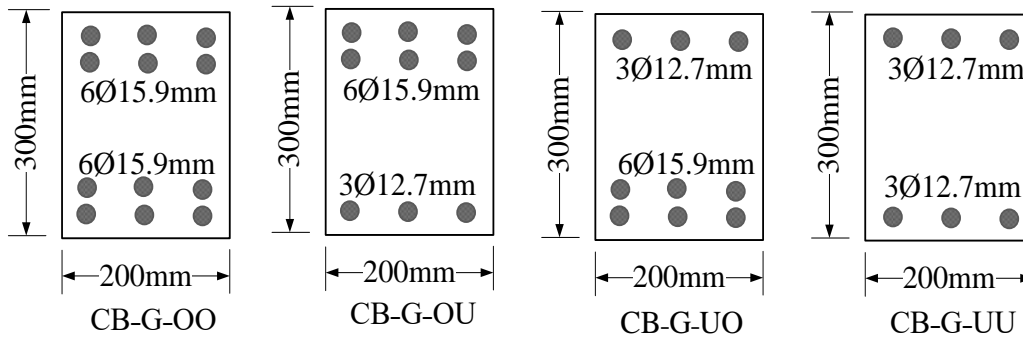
Reinforcement Details and Configurations of GFRP- Concrete Beams.
